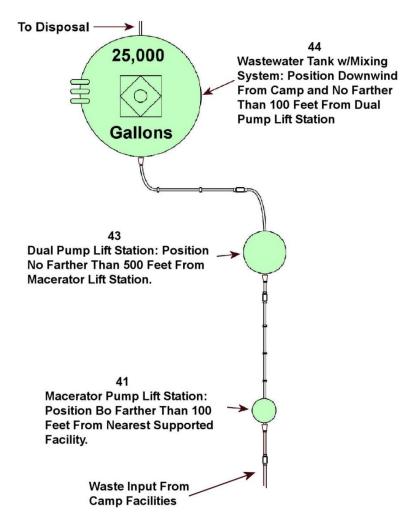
Wastewater Lift Stations and Tank Component Layout.
